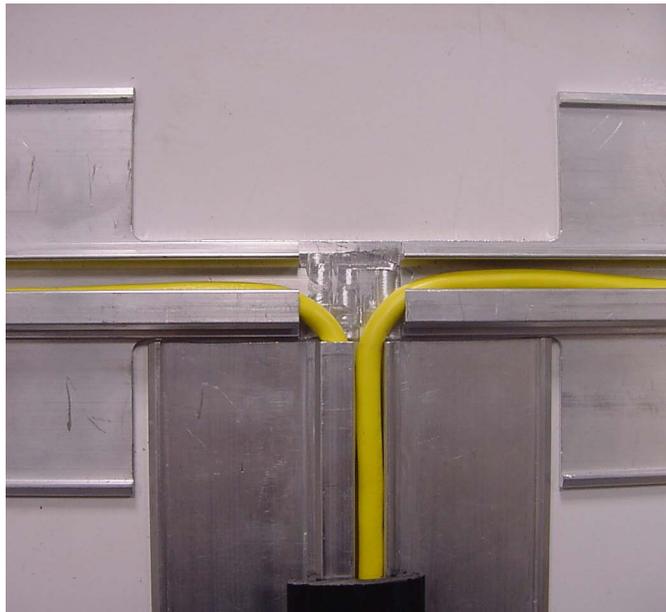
Picture of Joining Trim Cutout where Joining Trim enters Joining Trim
